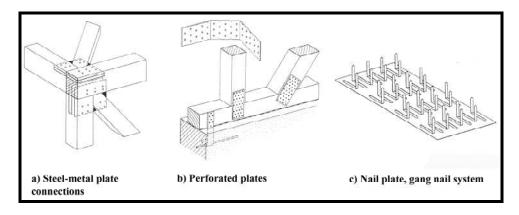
Various connections are used for jointing timber members (Götz et al., 1989:52).
